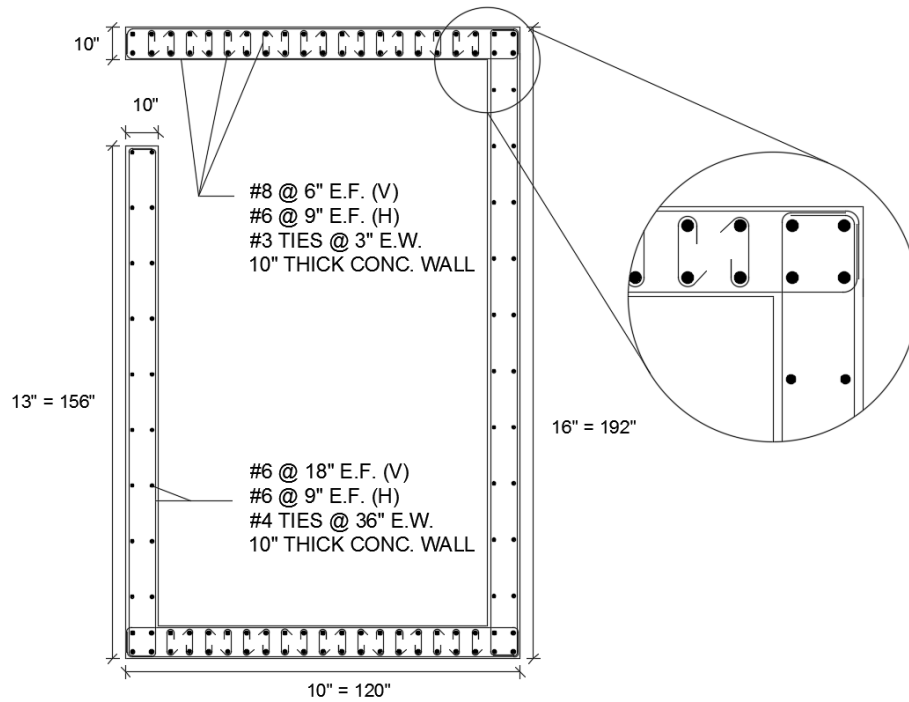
New stairwell shear wall cross-section at the 3rd floor level
